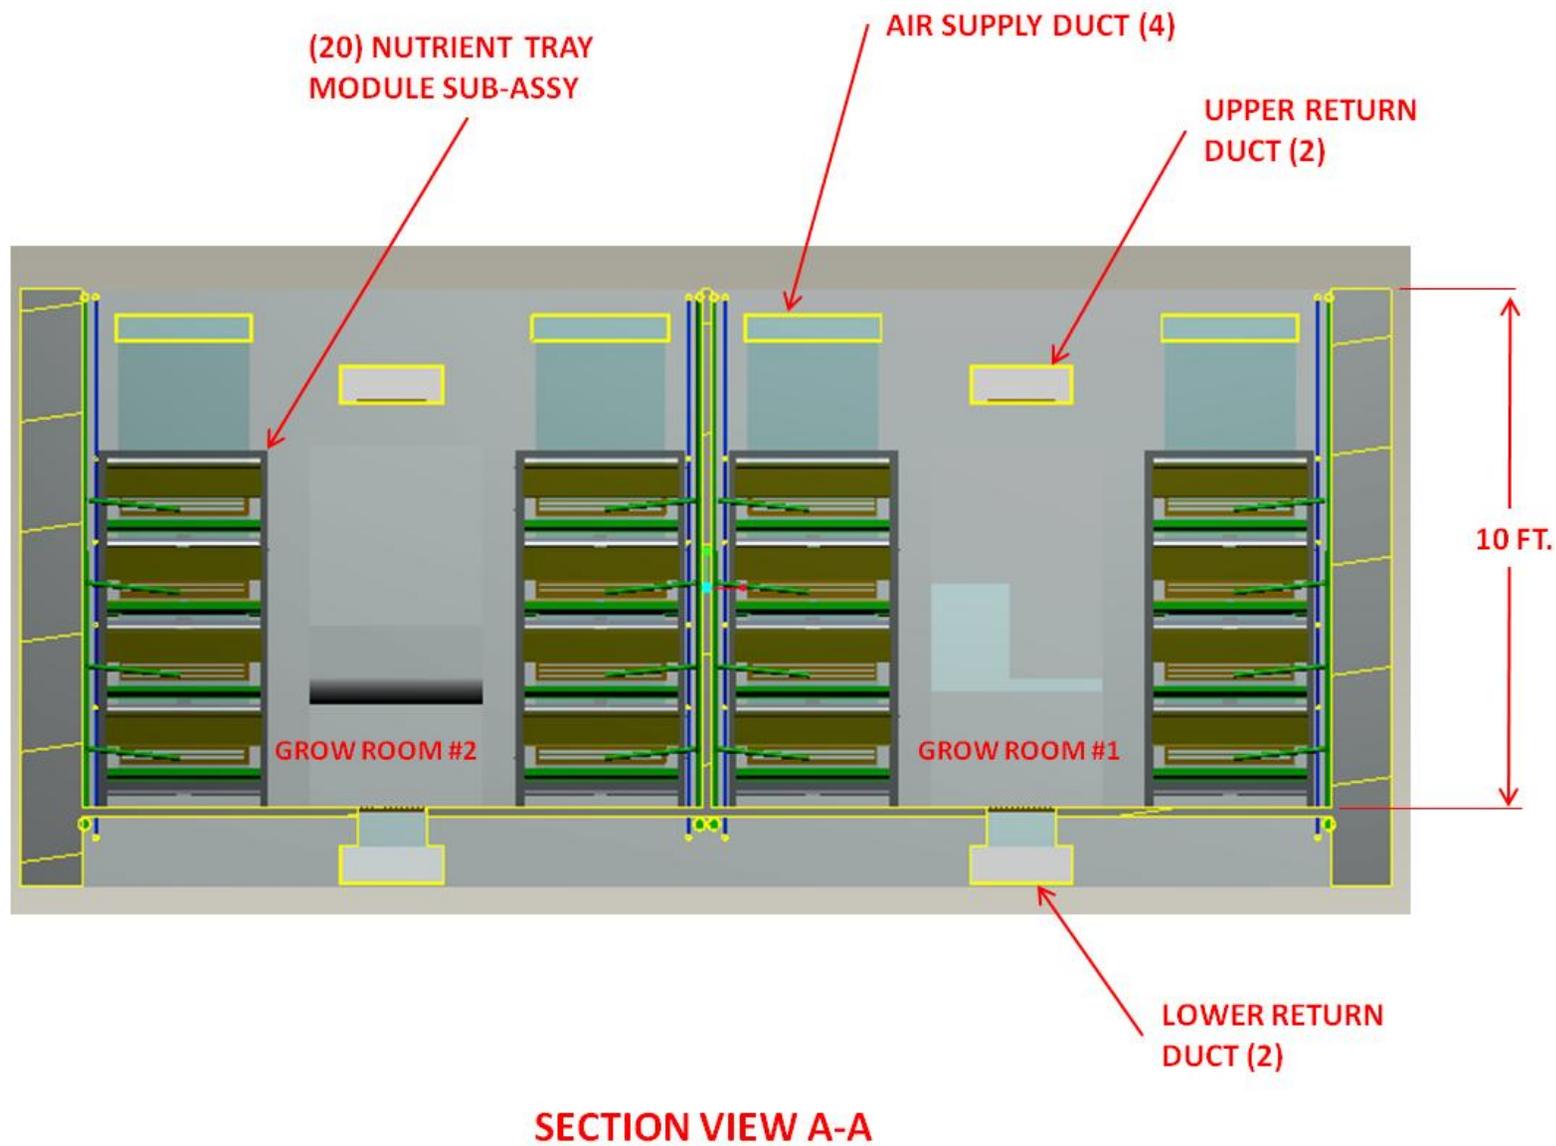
AgNorth pilot-scale facility cross-sectional view
